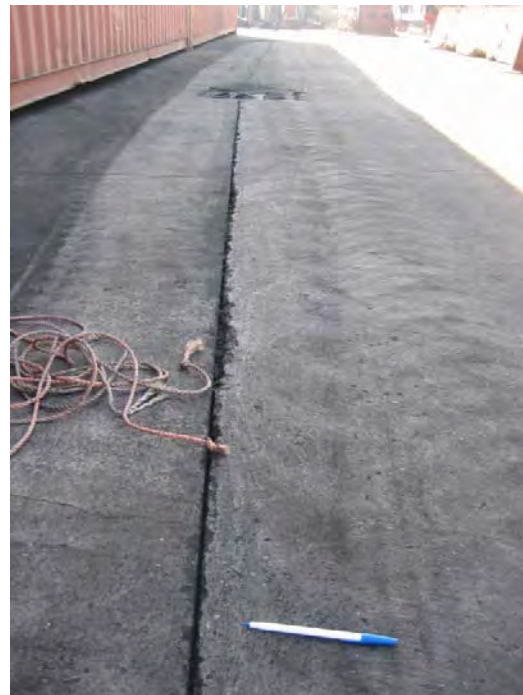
Looking south toward drain inlet 3-DI-11A: Thick seam noted in concrete cap.
